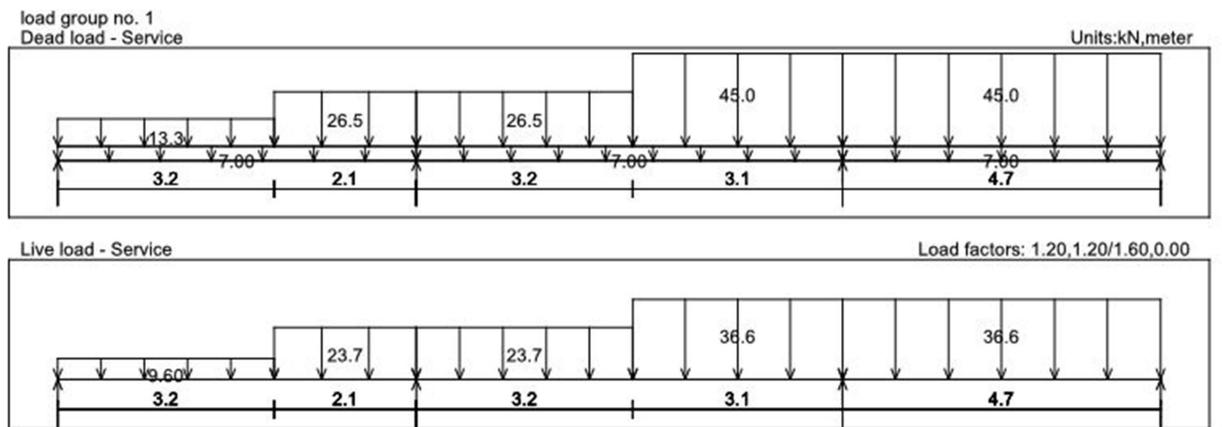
Statically System and Loads Distribution of Beam (B 11).
